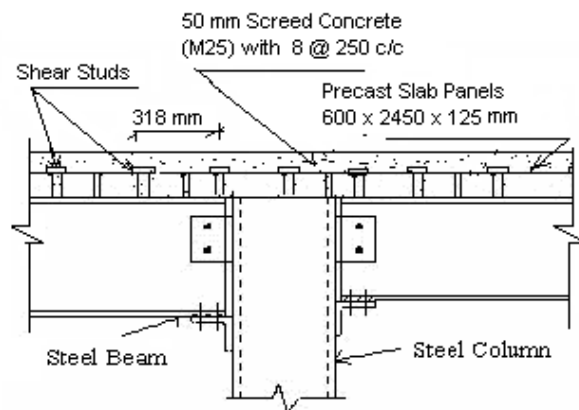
Section of Steel Frame Beam and Slab Panel with Precast Concrete Floor
